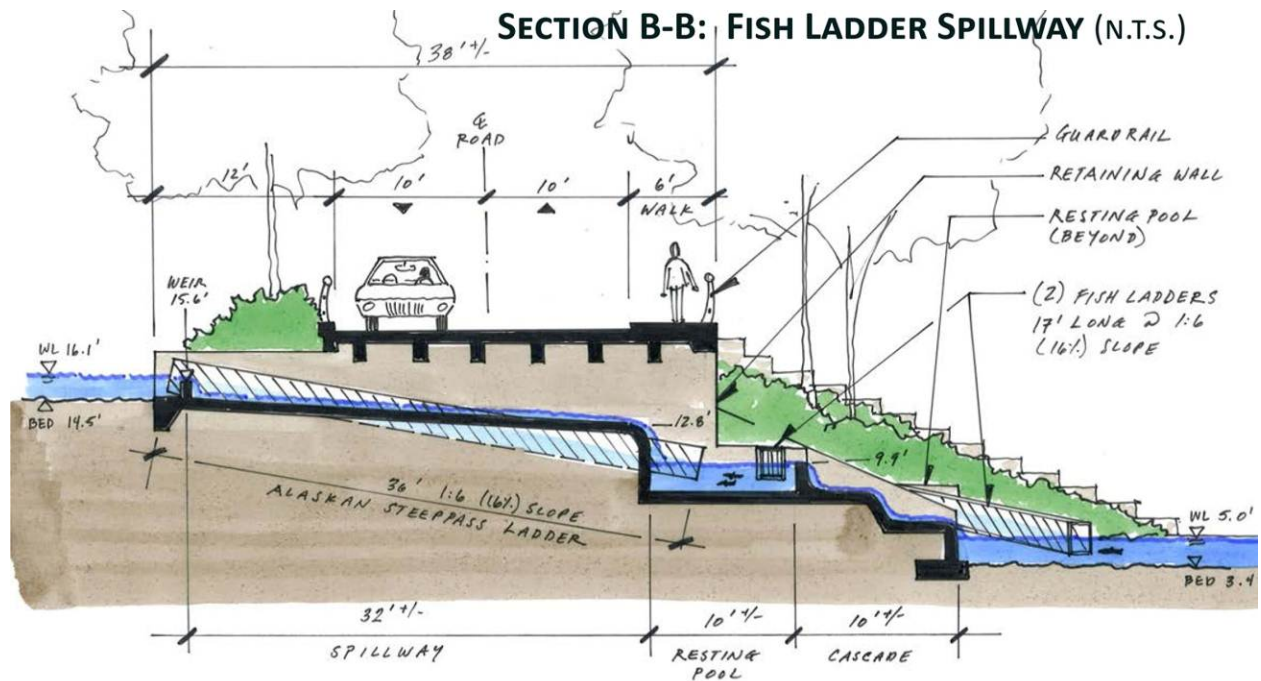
Concept Section sketch - fish ladder retrofit into new or existing Forge Road Dam spillway structure.
